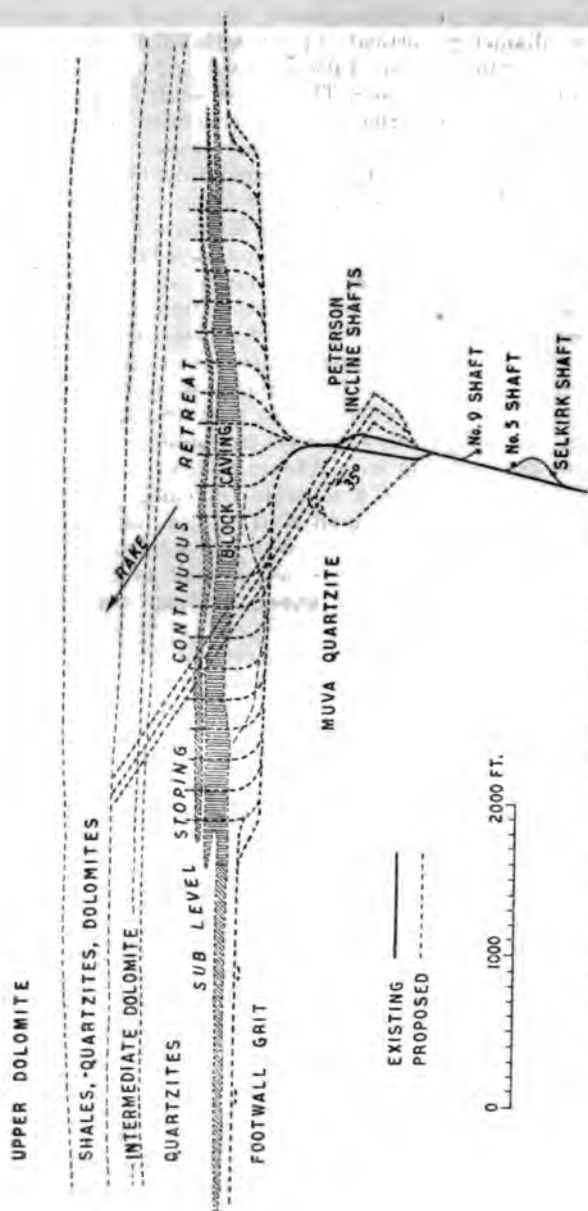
Plan of proposed 1,650-ft. level, showing orebodies and mining methods.
